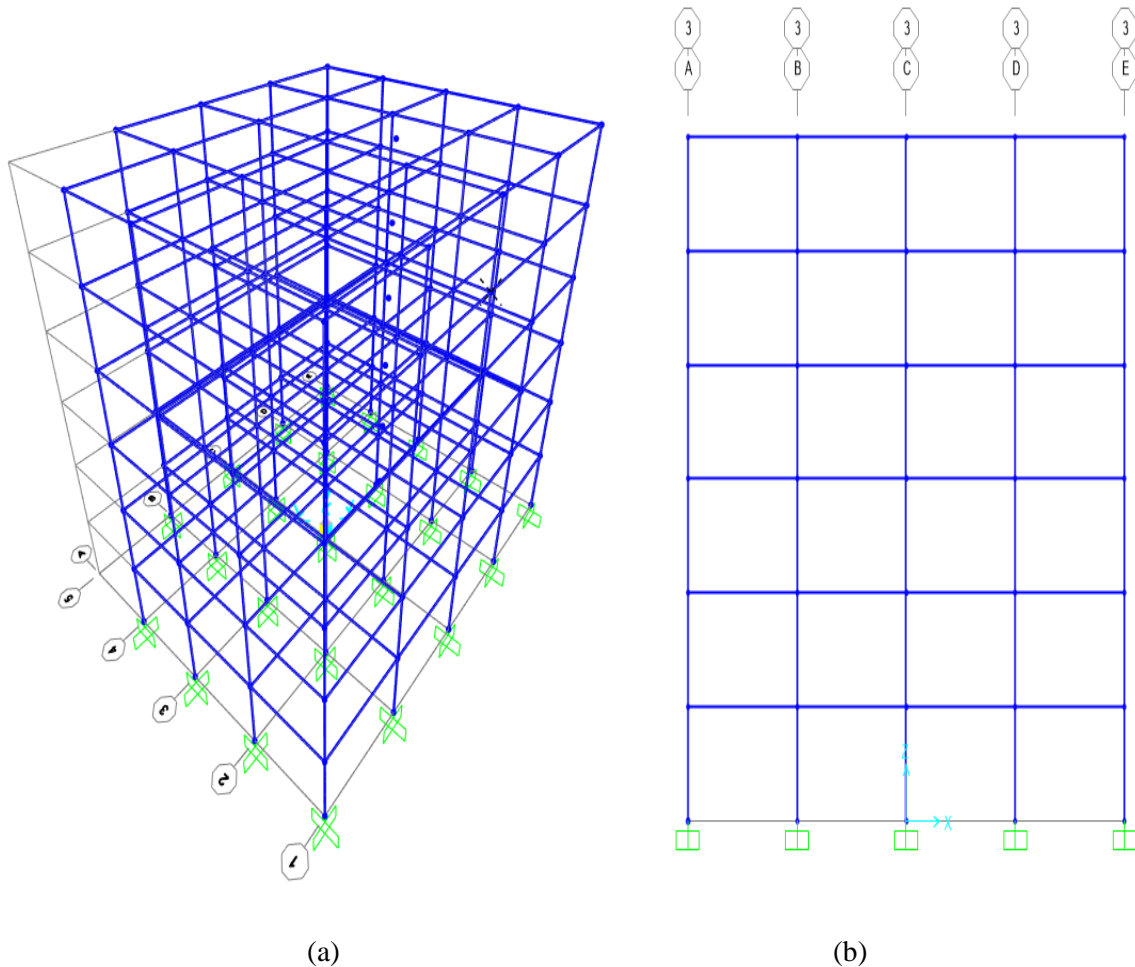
Building with fixed base modeled in SAP2000 : (a) 3D view and (b) Elevation
